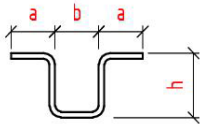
Layout of anchoring reinforcement. Alternative shape of -P4 bars, see Table 2.
